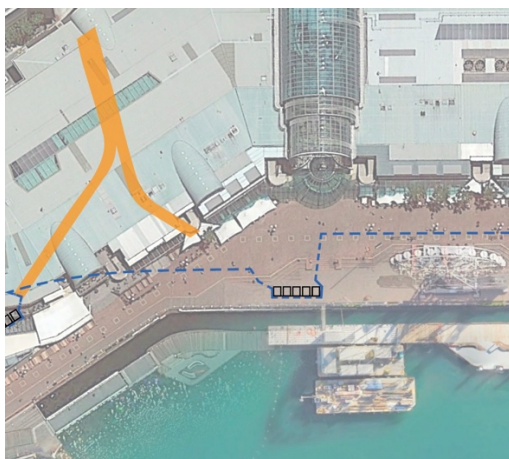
Overlay showing discharge entrance in relation to plan of conduit.
